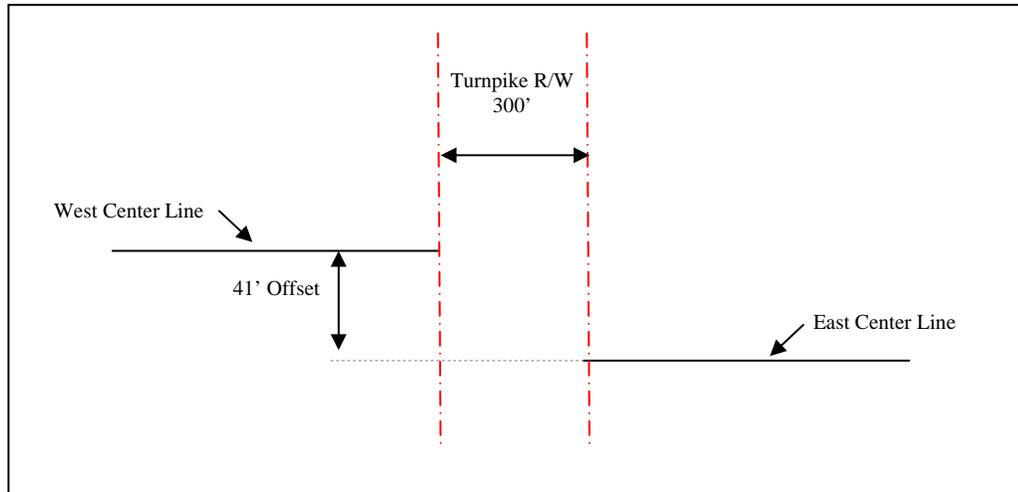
; Plan View, Offset Roadway Centerlines for Oakes Road
